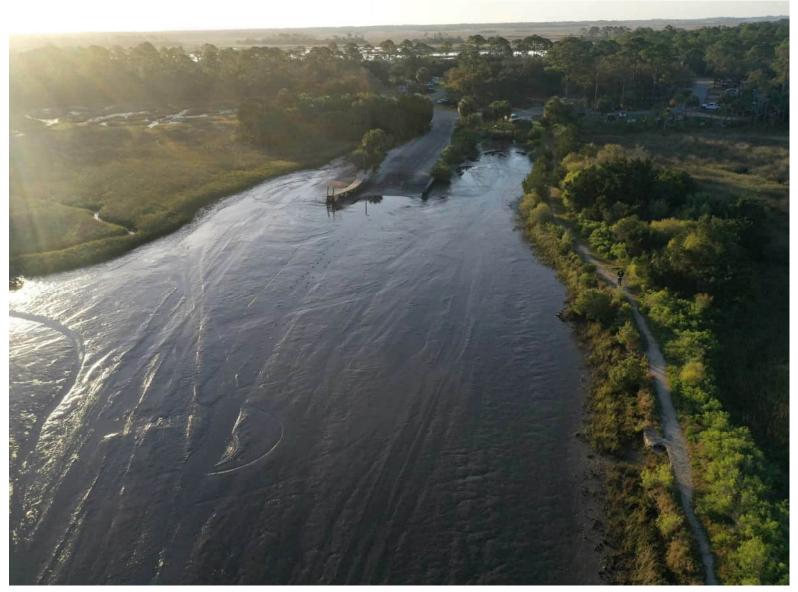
LOOKING SOUTHEAST TOWARD BOAT RAMP. NO DEFINABLE BOAT CHANNEL DUE TO SEDIMENT BUILDUP SINCE LAST DREDGING IN 1990.
